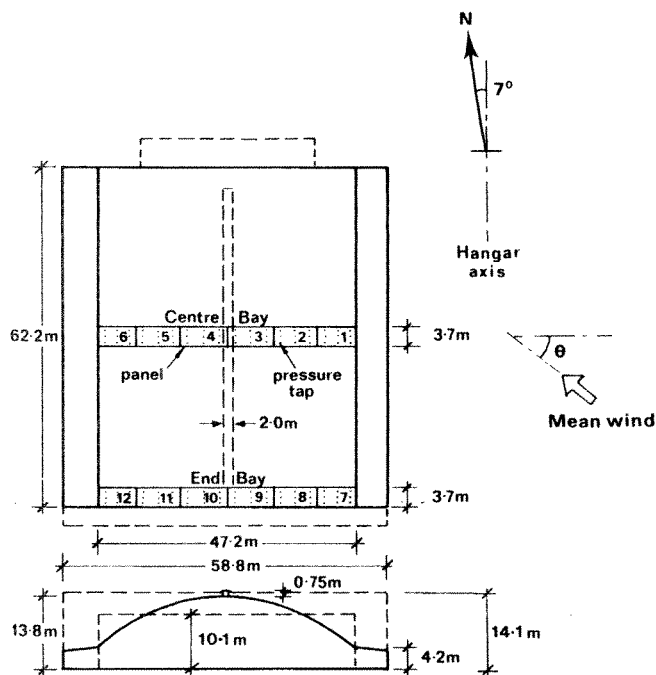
Dimensions of building (full-scale); pressure taps and panels
